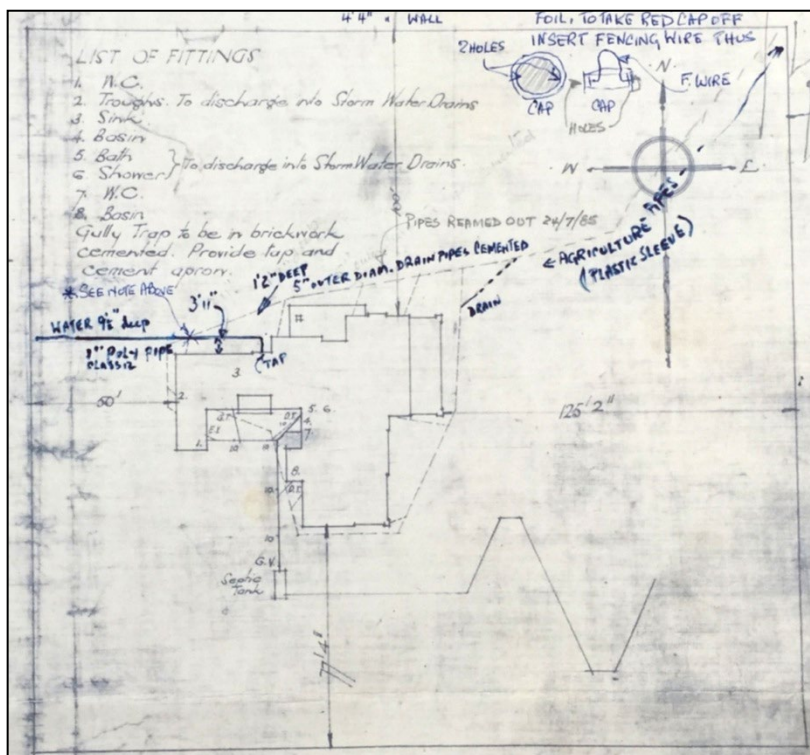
Block plan. Drawing by architects Oakley & Parkes, dated December 1930, with later annotations in blue (2018 owner's collection).
